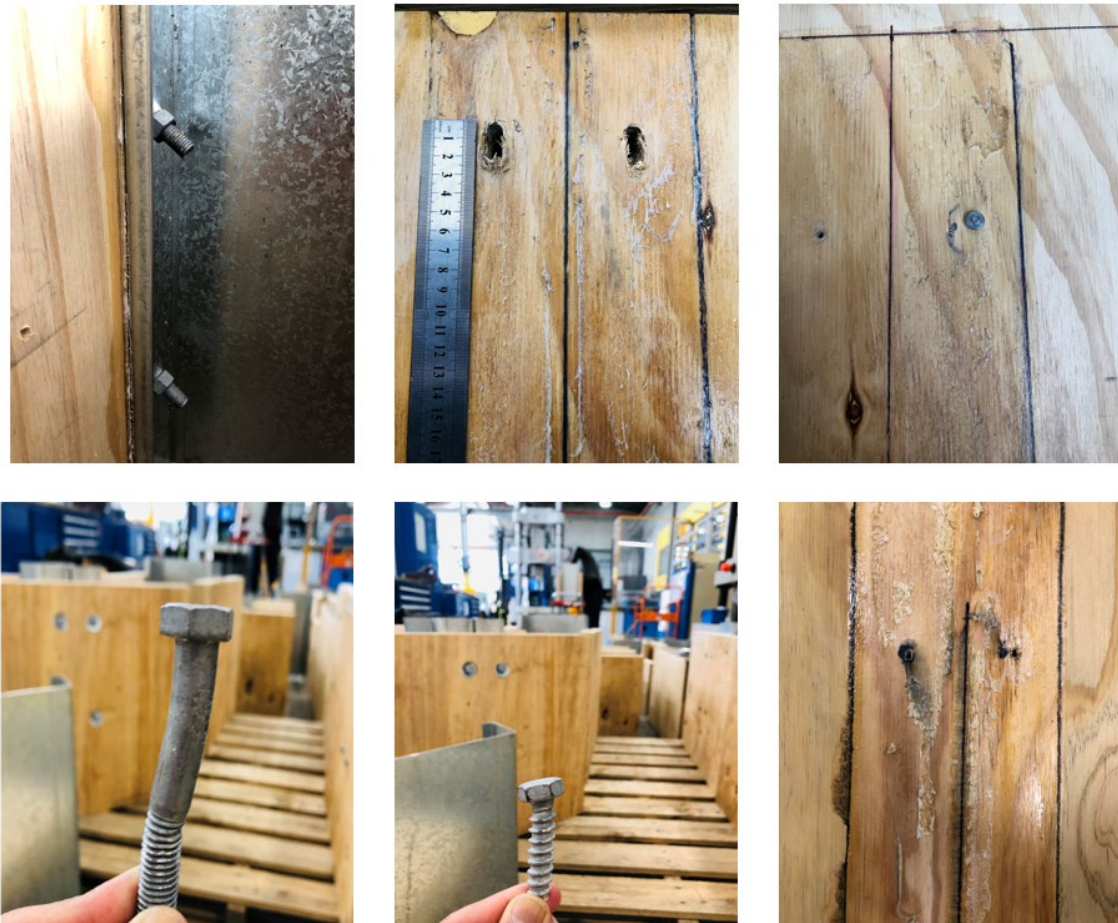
Failure modes of the specimens with fasteners + adhesives
